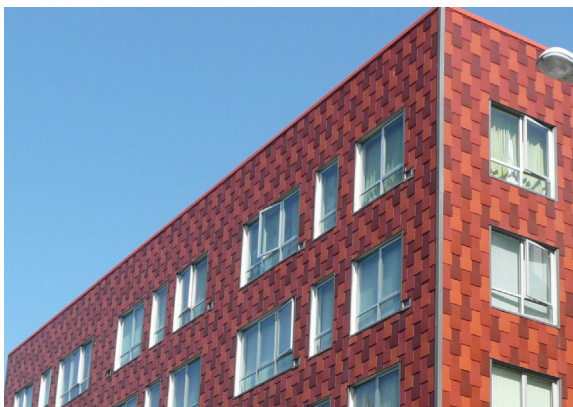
d.1.e. (1) Metal panel siding on street-facing façade.
